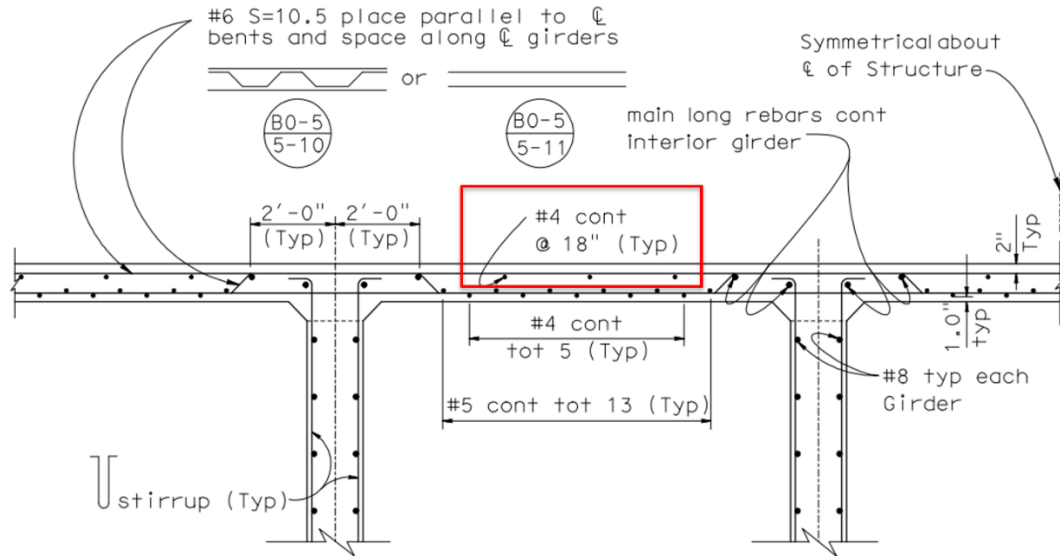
Typical reinforced concrete deck cross section (Caltrans, 2015)
